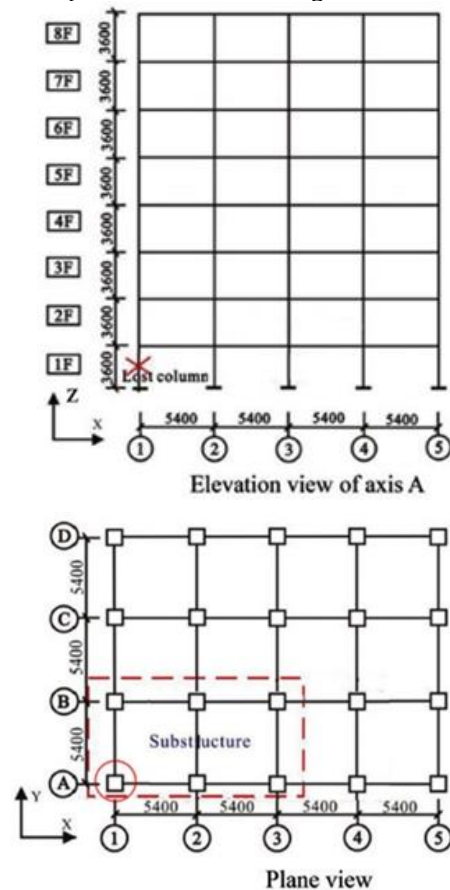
Scenario change in loading: Plan and elevation of the 8-story building with assumed failure at the corner column.
